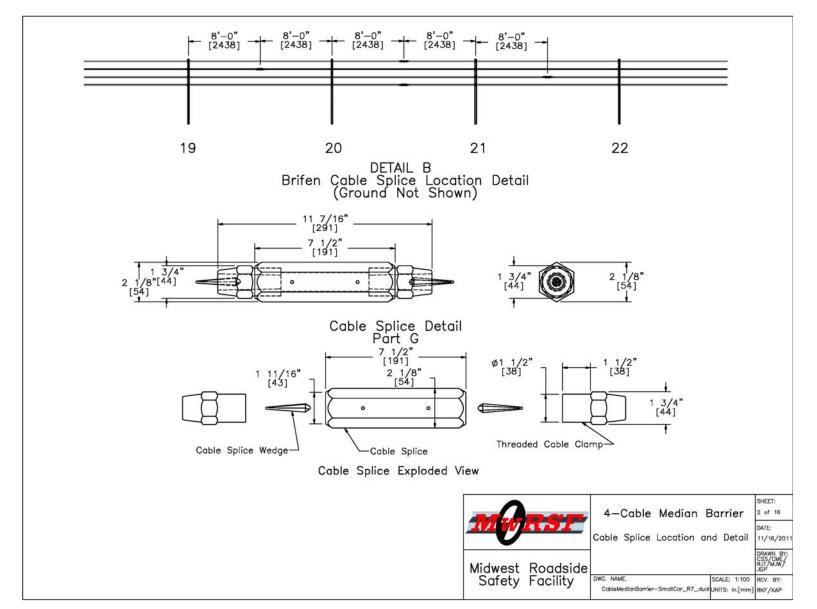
Cable Splice Location and Detail, Test No. 4CMB-2
